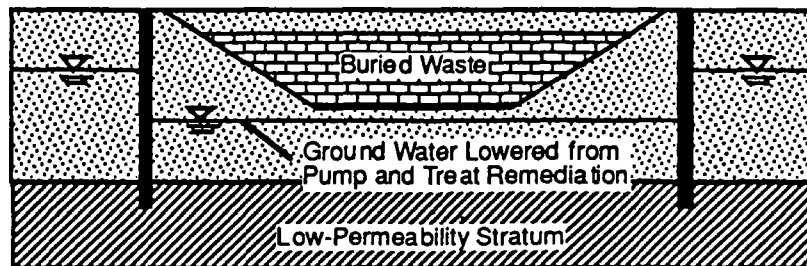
Example of Vertical Cutoff Wall to Restrict Inward Migration of Ground Water.
